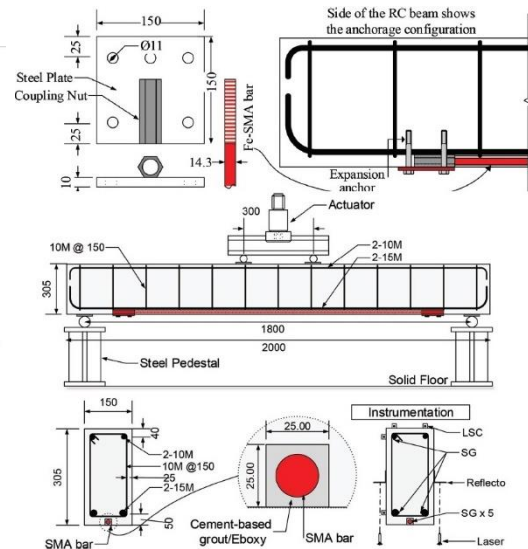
Near surface mounted SMA bar in reinforced concrete beam (Rojob and El-Hacha, 2017)
